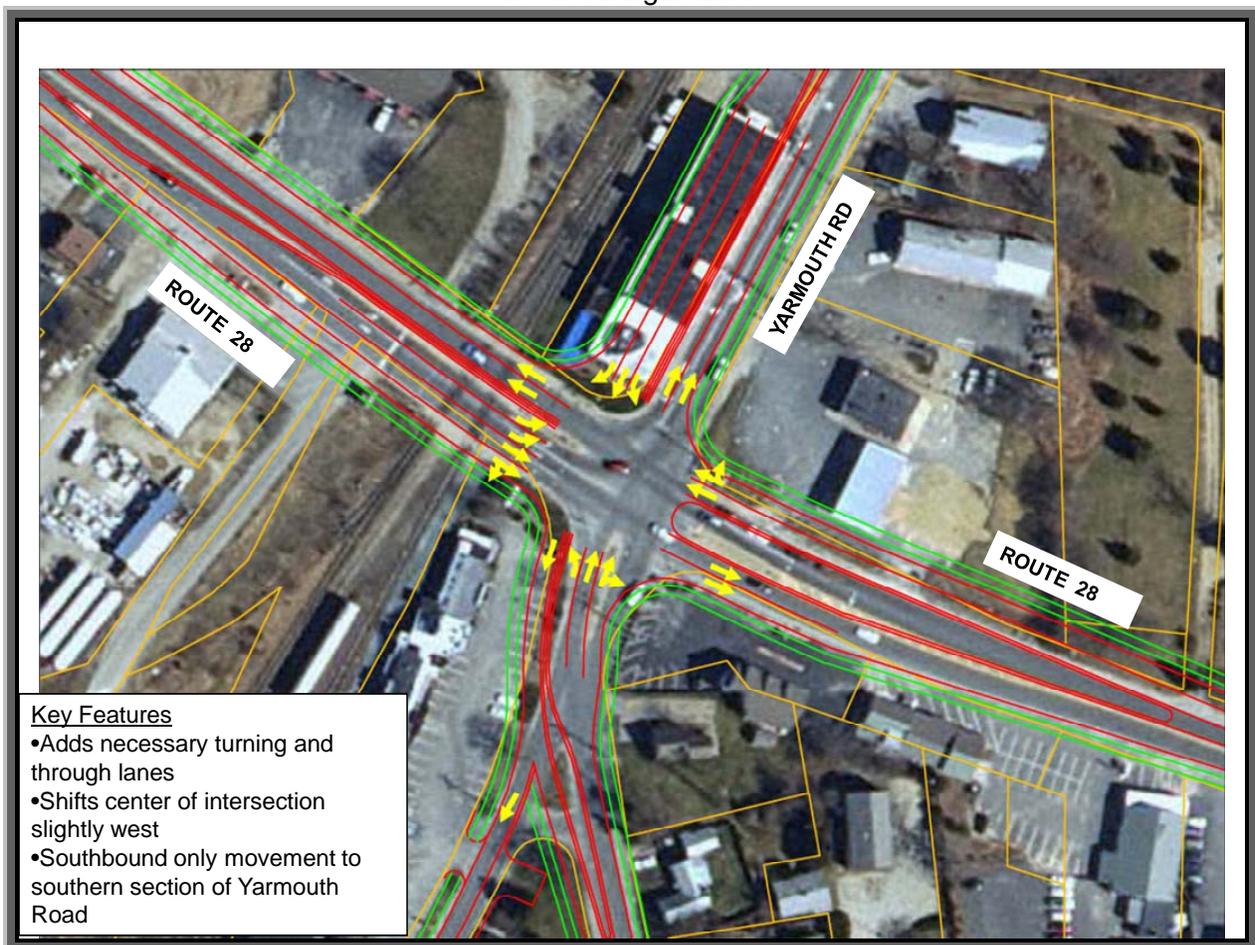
(b): Proposed Intersection Improvements to Yarmouth Road / Route 28 East Configuration
